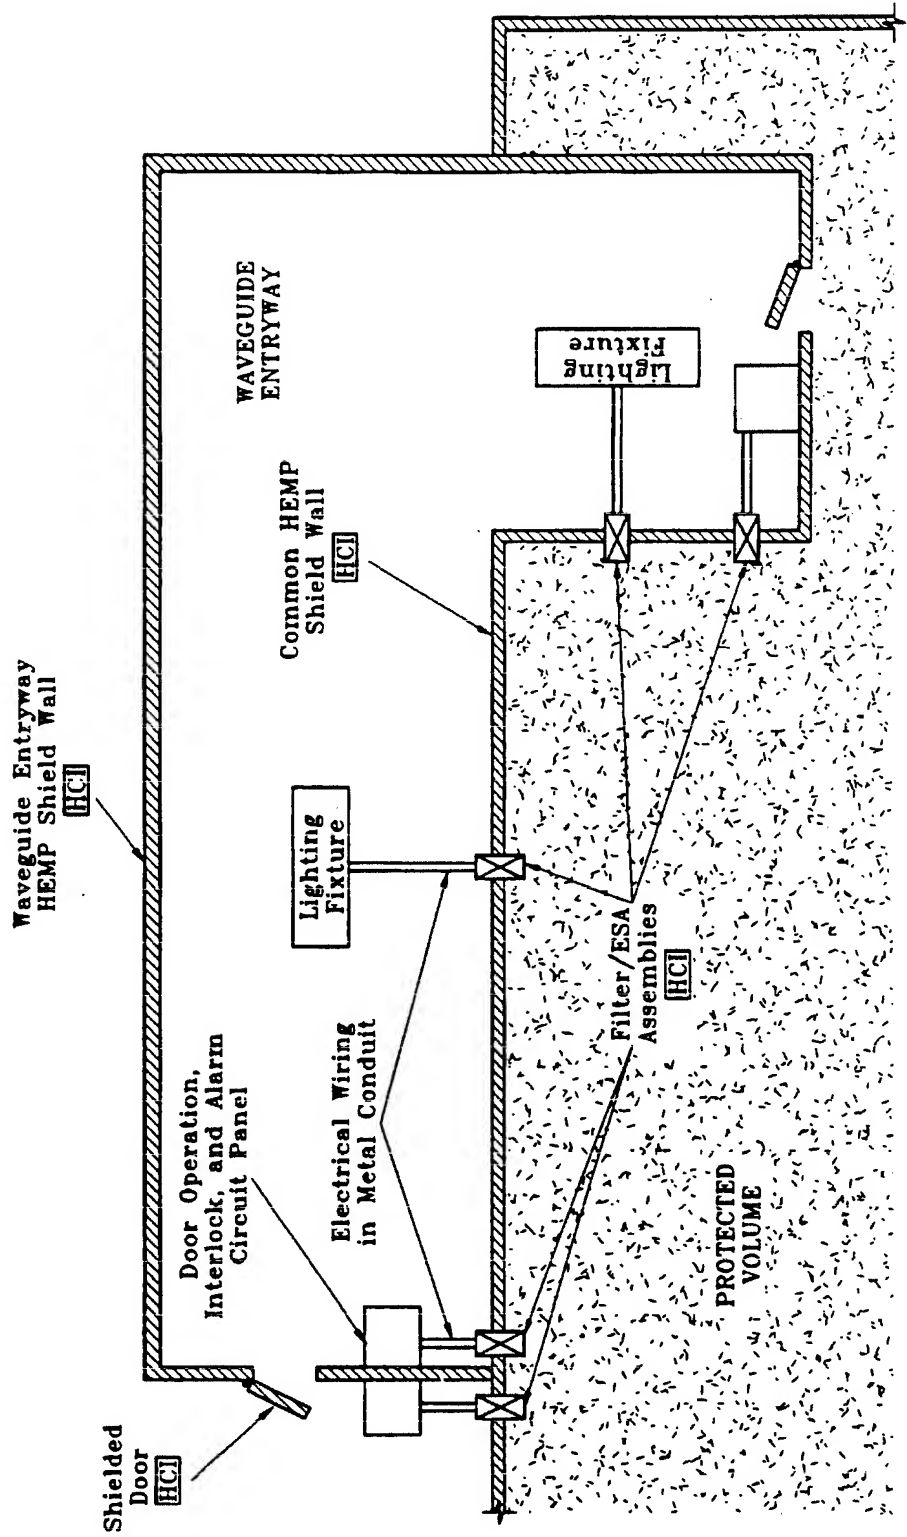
Waveguide entryway electrical installation without longitudinal conduits.
